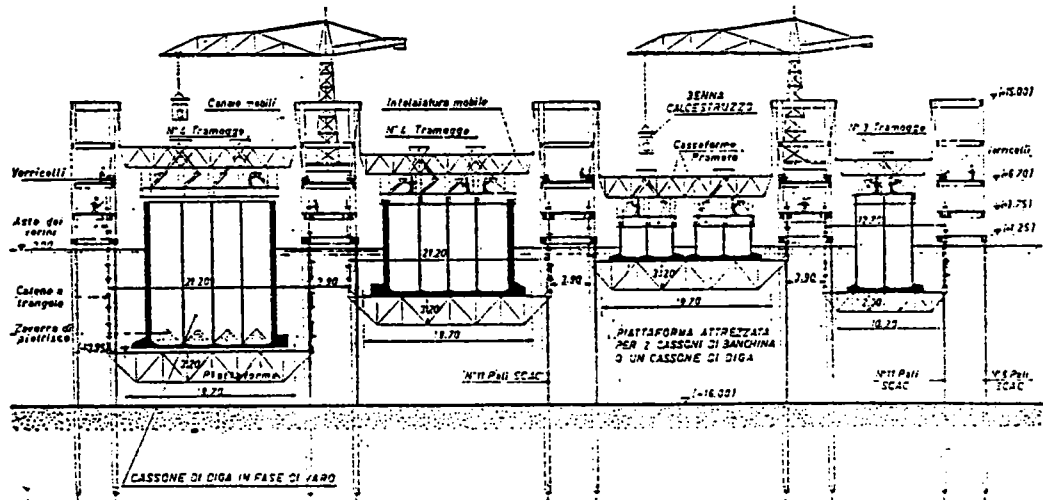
The first fixed caisson construction yard at Ponte Canepa, Genoa
